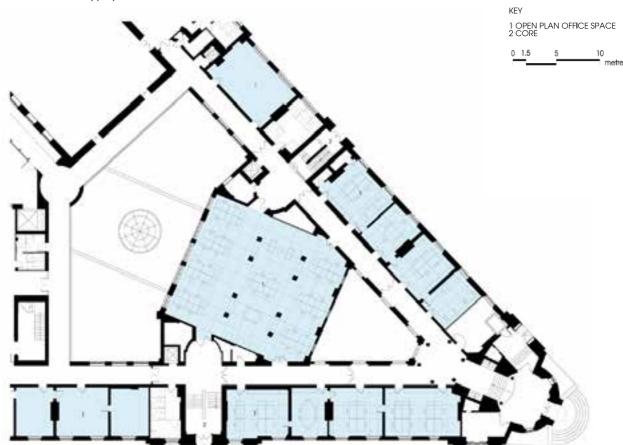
TOWN HALL FURNITURE STRATEGY, TYPICAL LAYOUT ILLUSTRATING EFFICIENT PLAN WITH A GOOD BALANCE OF SUPPORT SPACE : FID SPACE
